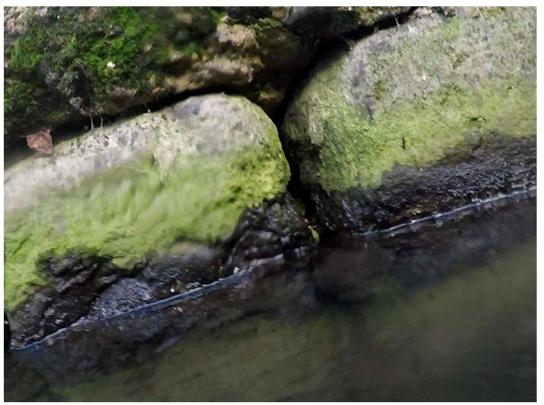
Formation of large gaps between masonry blockworks and concrete topping of Section 3
